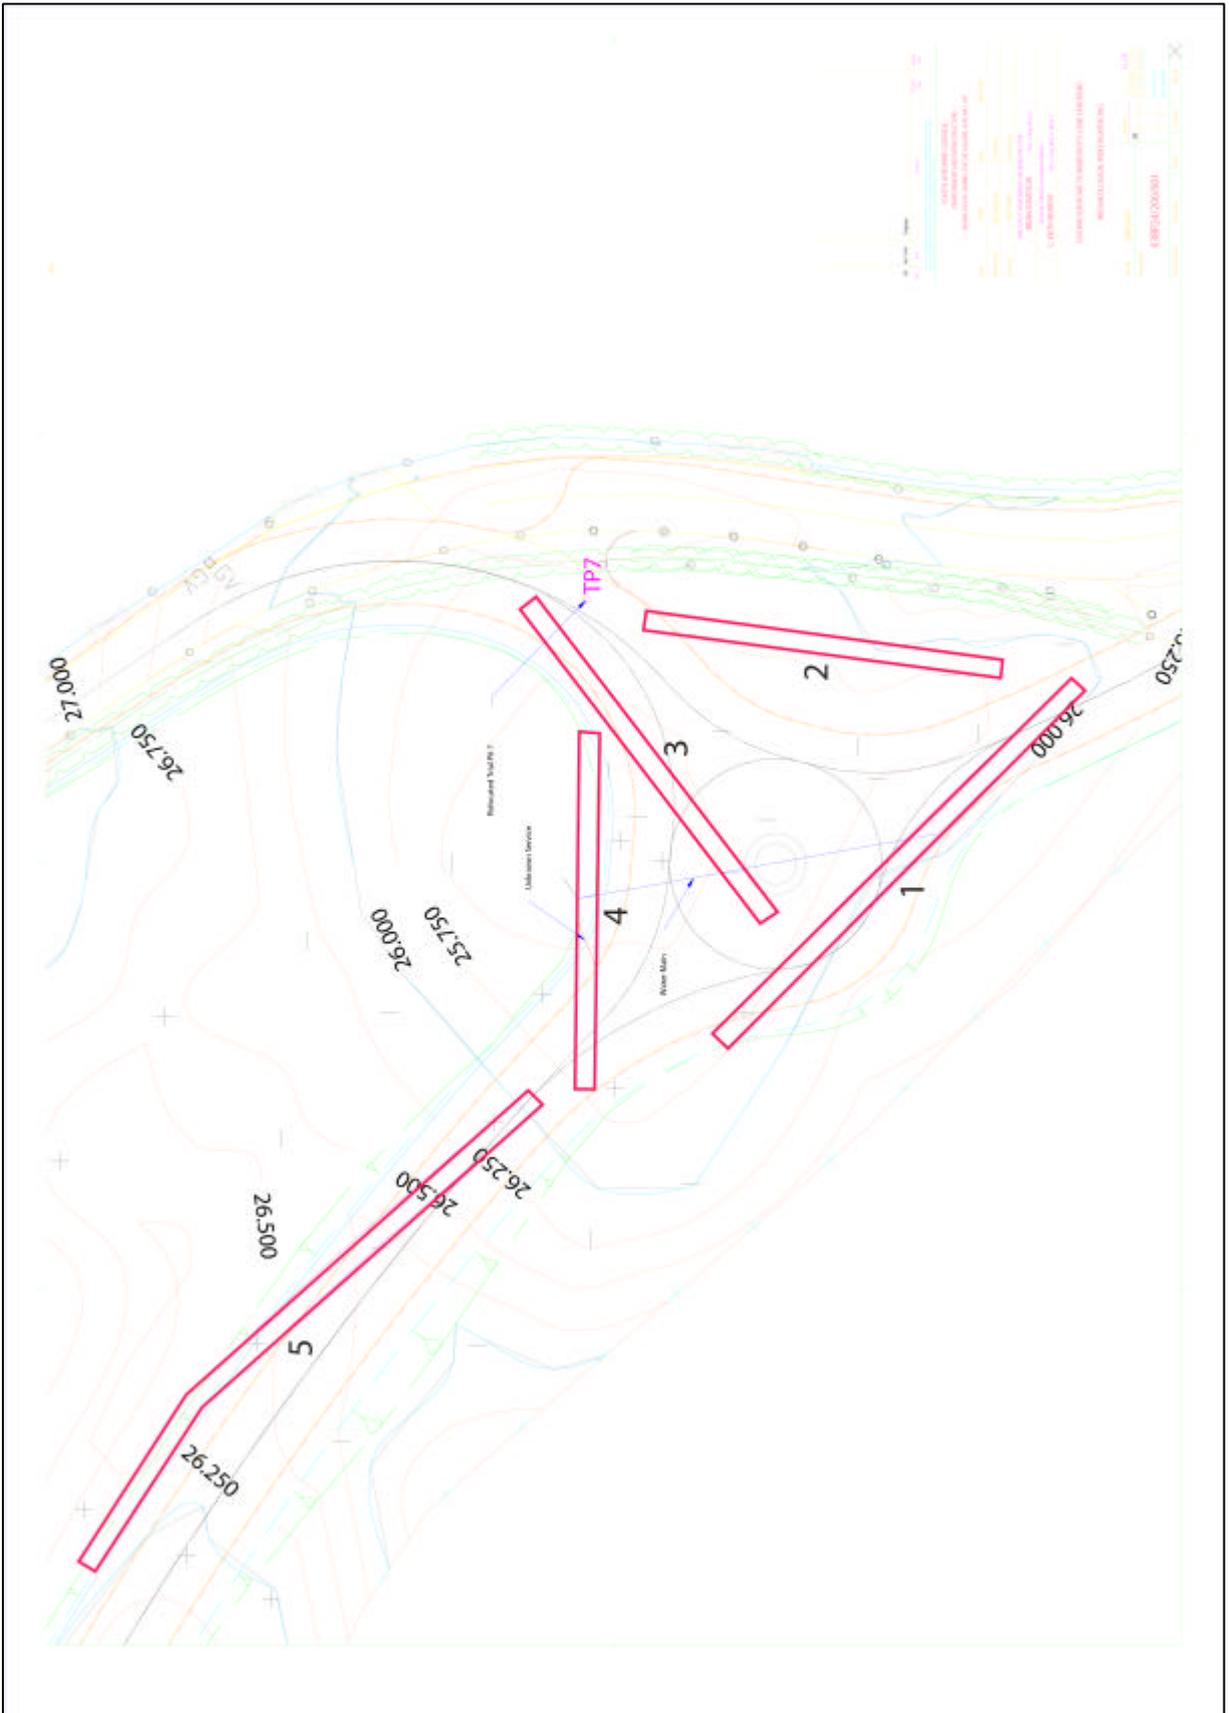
Trenches as excavated (in red); relative to topography and proposed road structure
